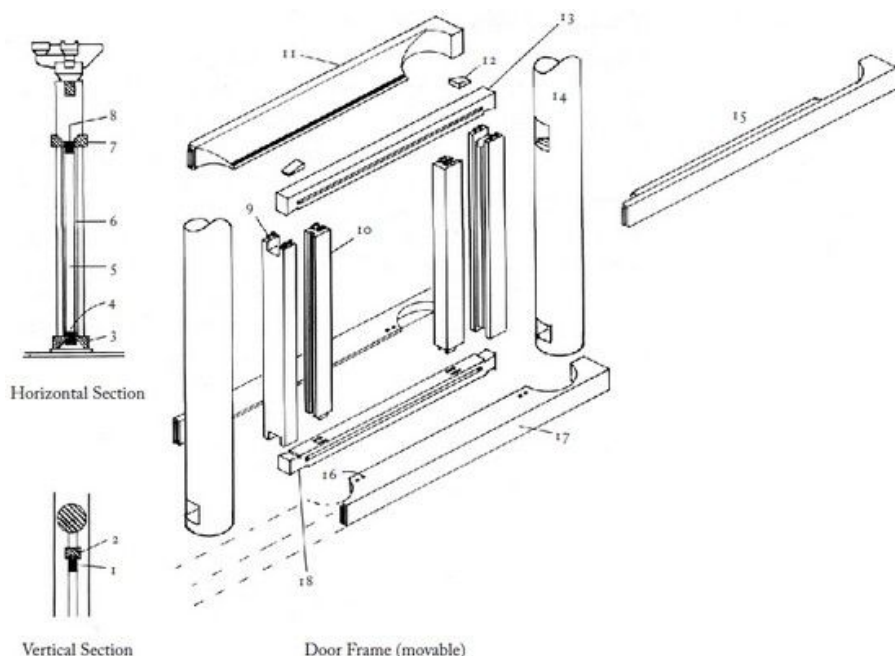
Door frame arrangement: 1. door post (movable); 2. door frame (movable); 3. door sill; 4. base tie; 5. door post; 6. door frame; 7. brace beam; 8. tie beam; 9. small tenons (top and bottom); 10. door post (stationary); 11. brace beam; 12. wedge; 13. tie beam (movable when wedge removed); 14. column; 15. brace beam; 16. small holes for door frame tenons; 17. door sill; 18. base tie (not movable). (See also Fig. 40.)
